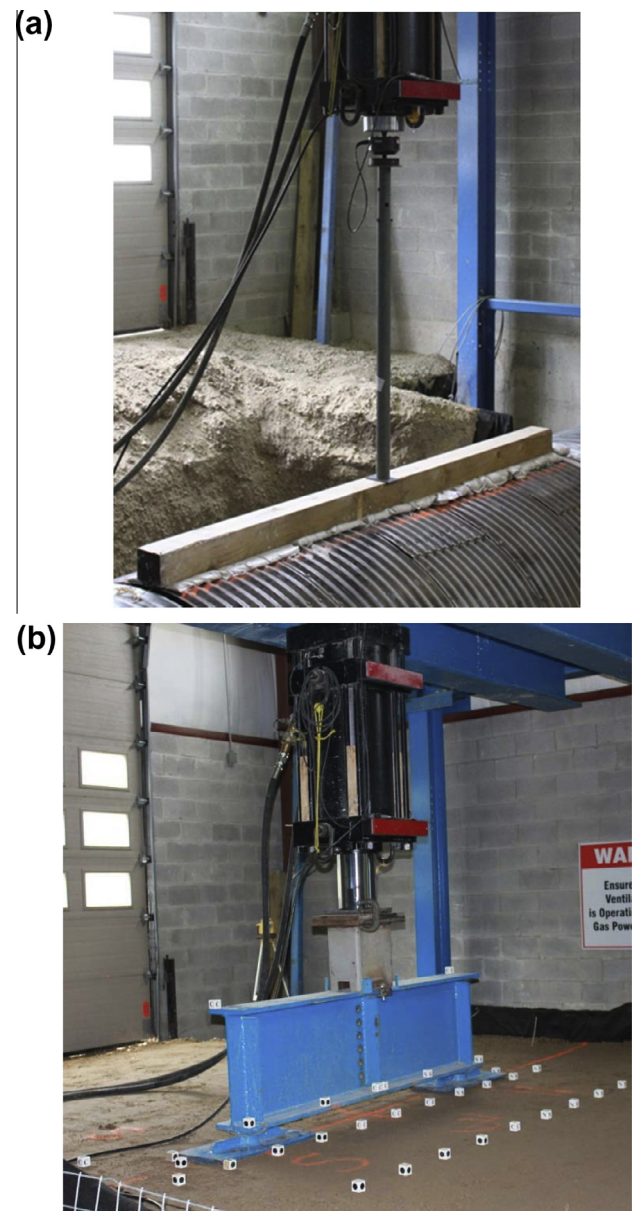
Pipe loading arrangement. (a) Culvert-only test with spreader beam and (b) live load tests with single axle and 0.6 m cover.
